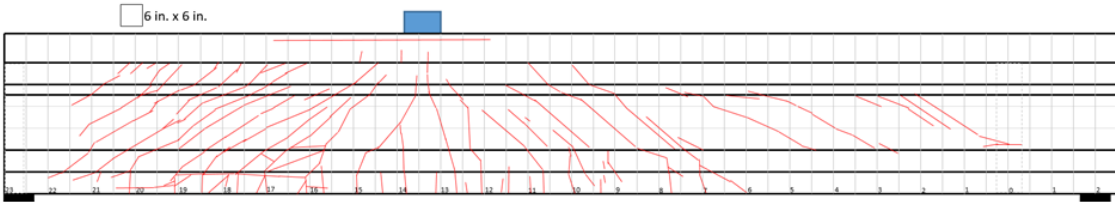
Test C1 cracking pattern, 6 in. grid shown
